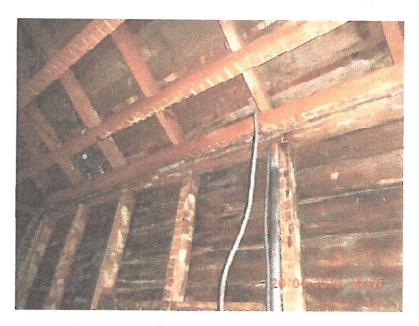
Inadequate load path, rafters bearing on ceiling joist
